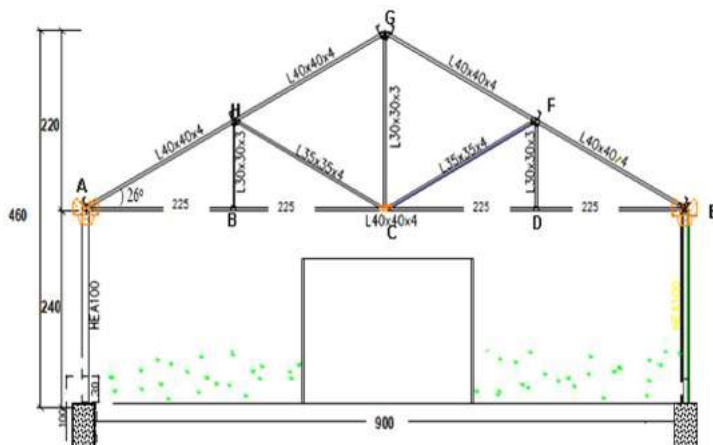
Glass Greenhouse Used in the Study (Section A-A)
